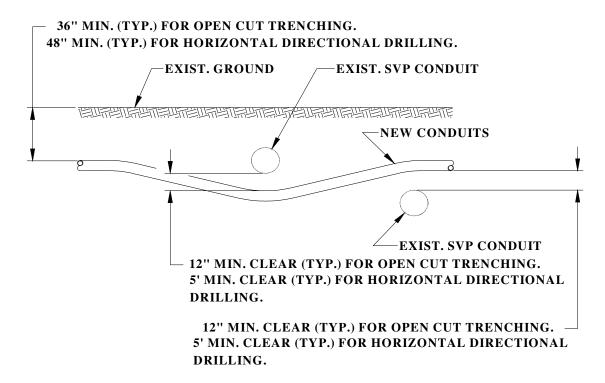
Perpendicular crossing of SVP Electric Conduits by new conduits
